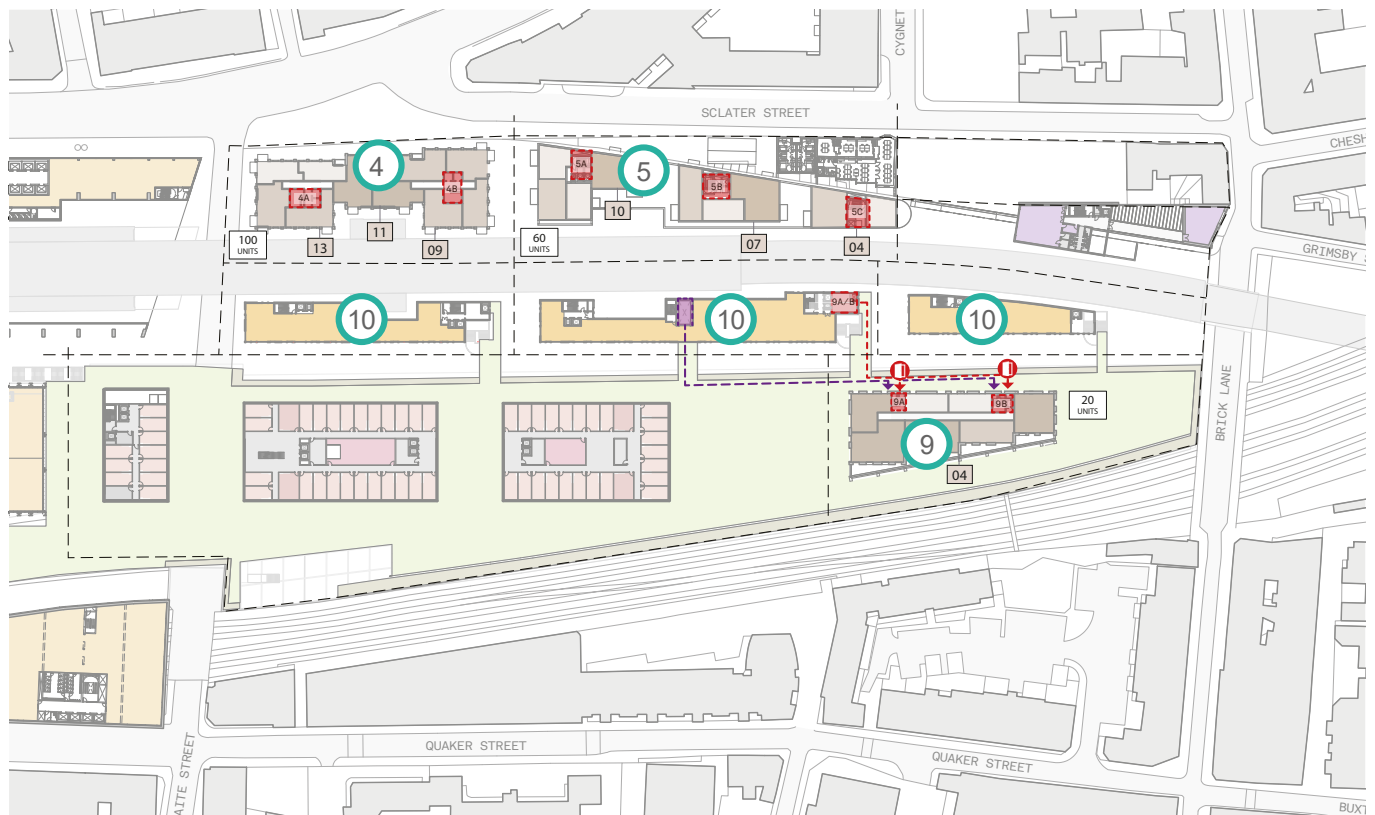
September 2018 Masterplan: typical upper floor (unit numbers and storey heights)
